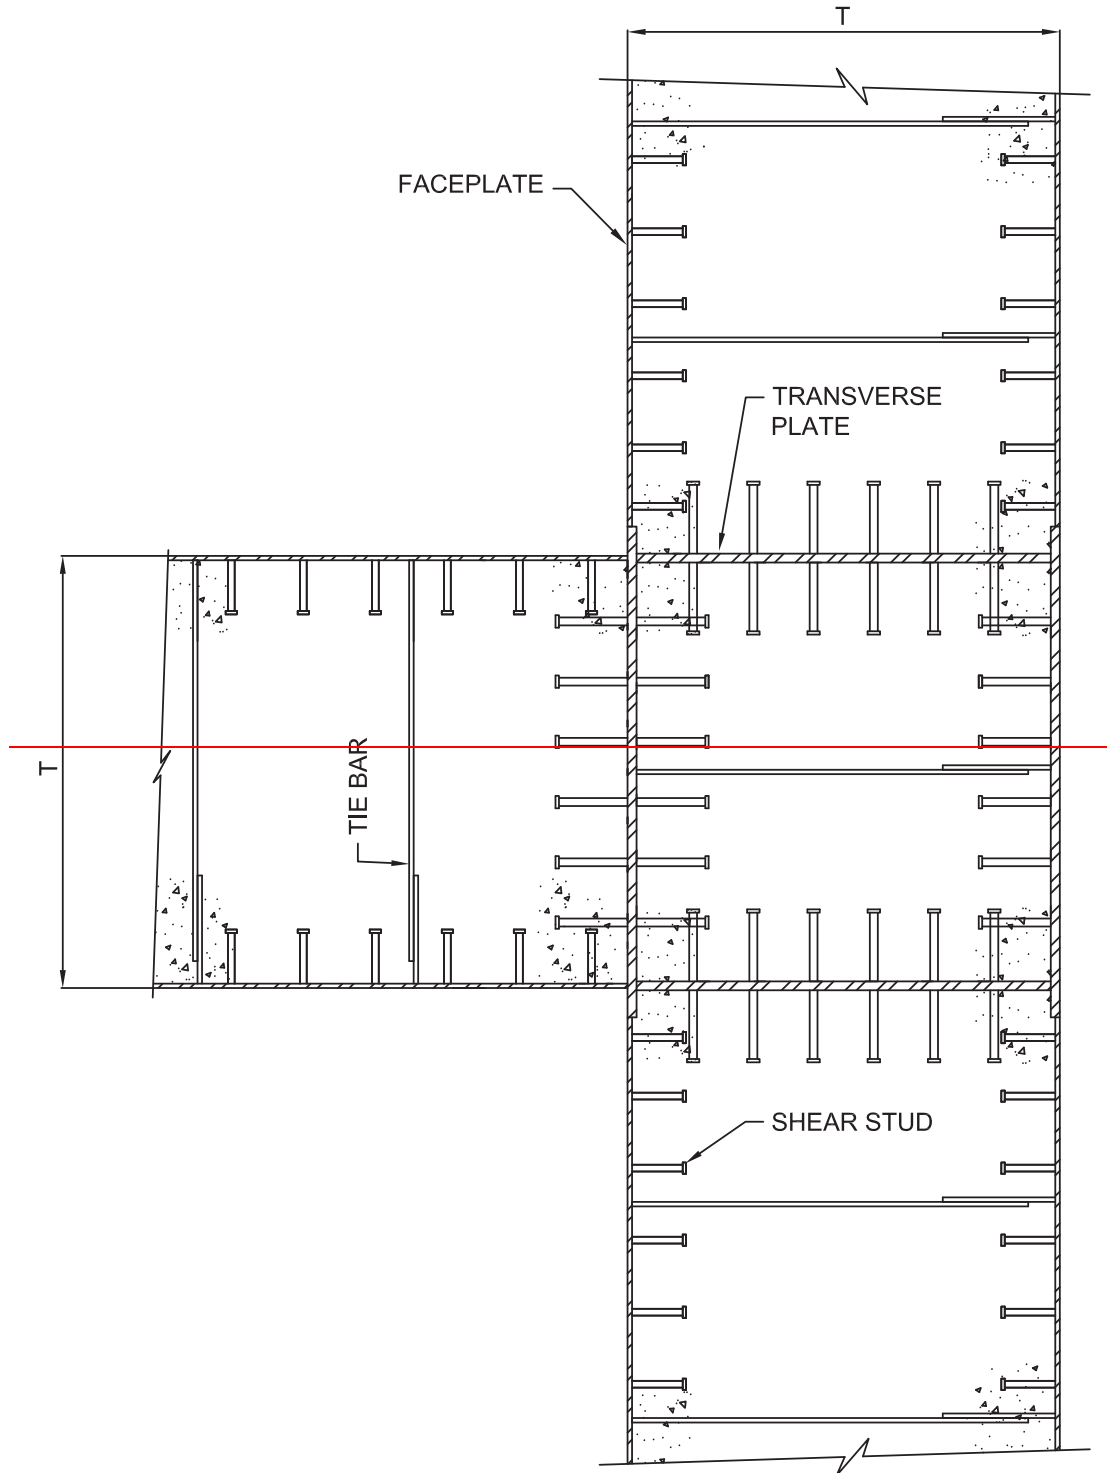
Typical Details of SC Modules ~~(Sheet 1 of 5)~~
